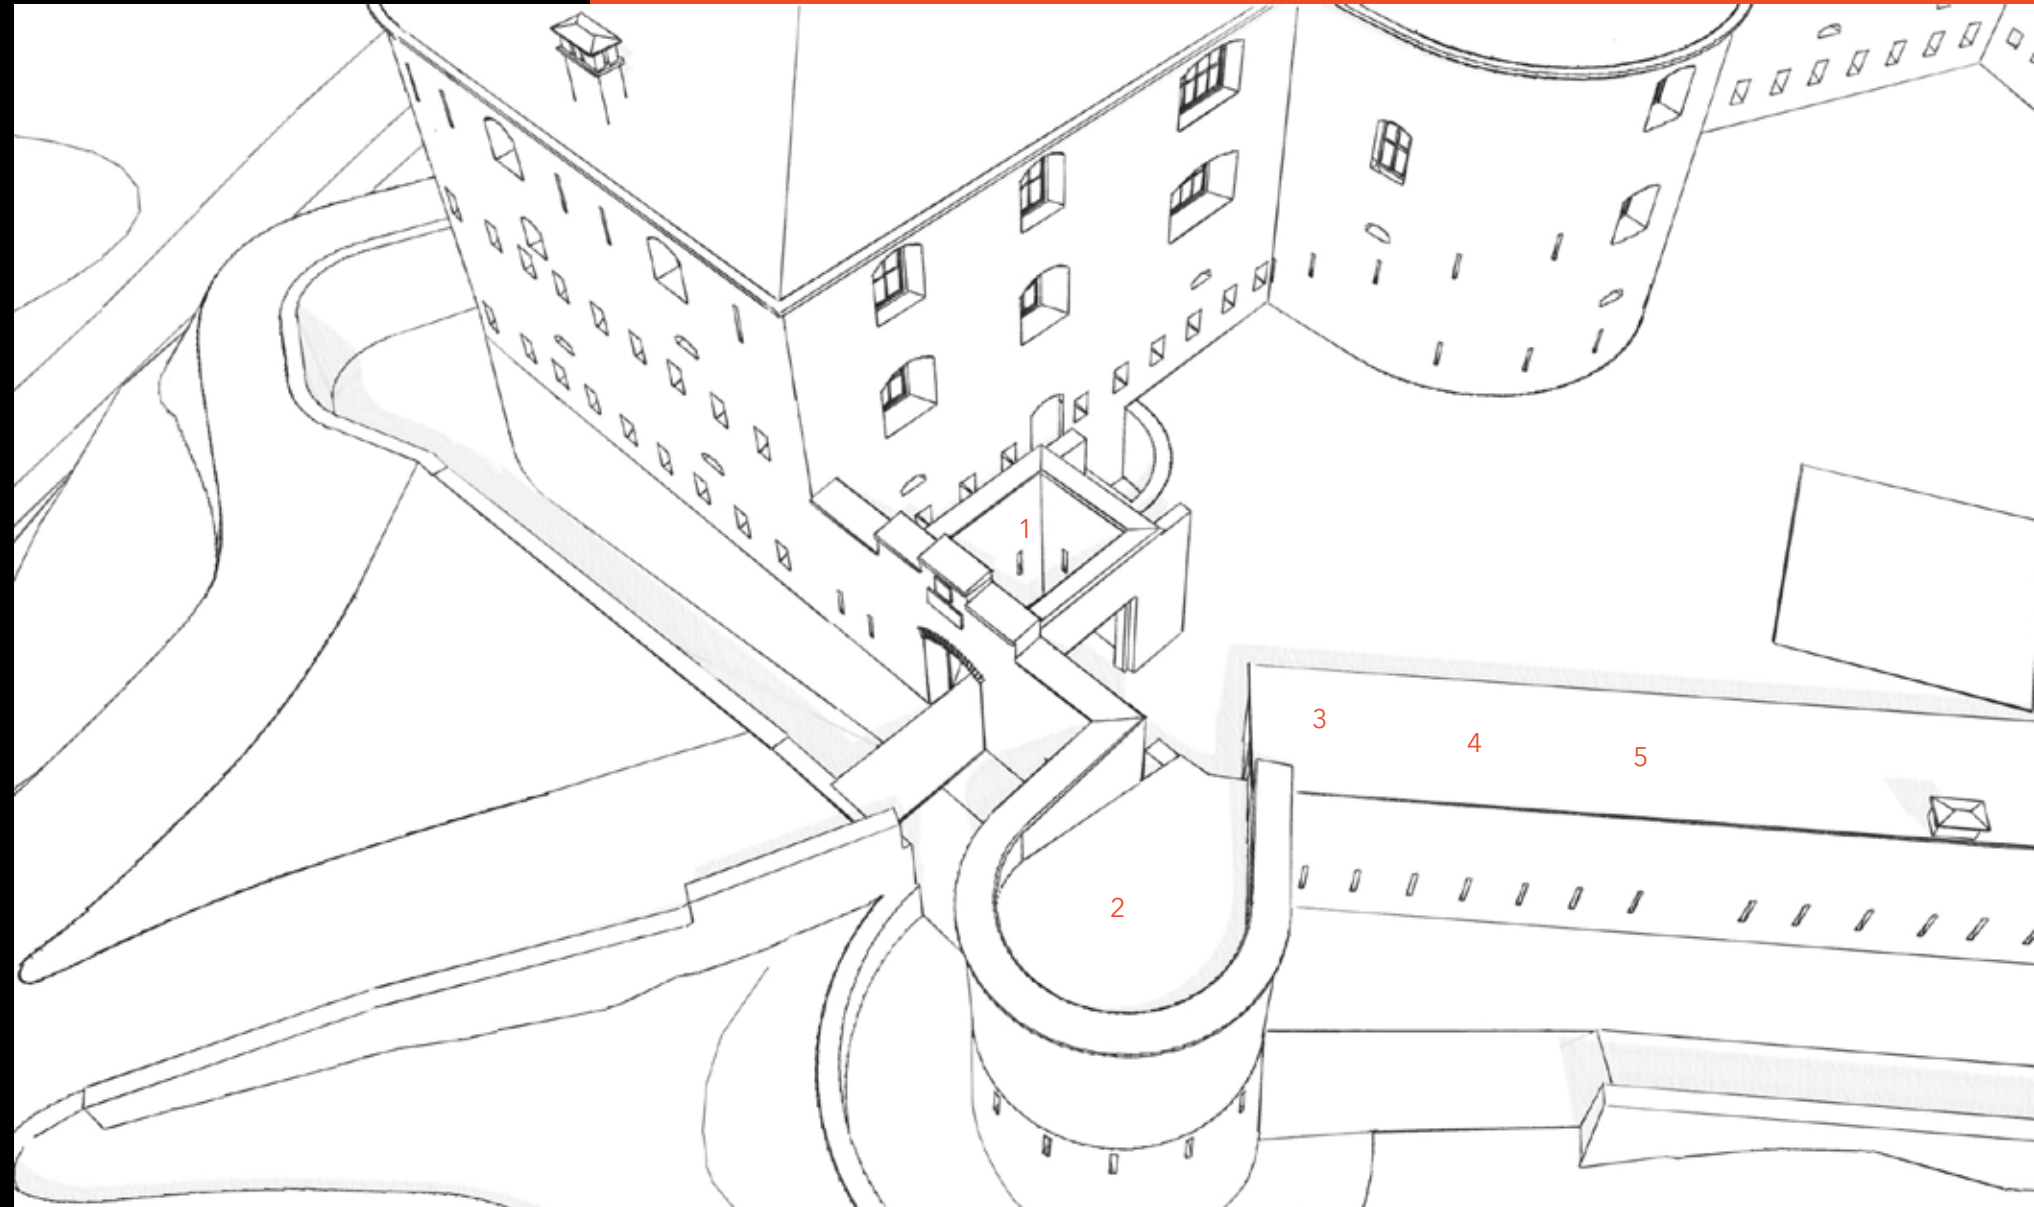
3D Reconstruction of the entrance based on the rapports plan from, 1902
